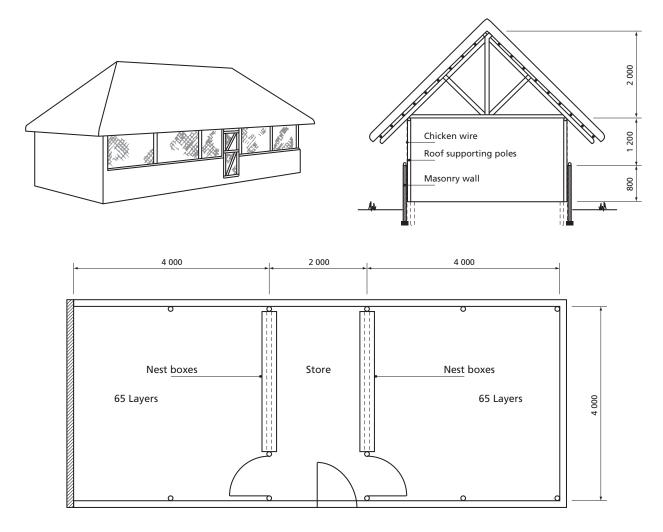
Deep-litter house for 130 layers (or 350 broilers): note the solid wall facing the prevailing wind
